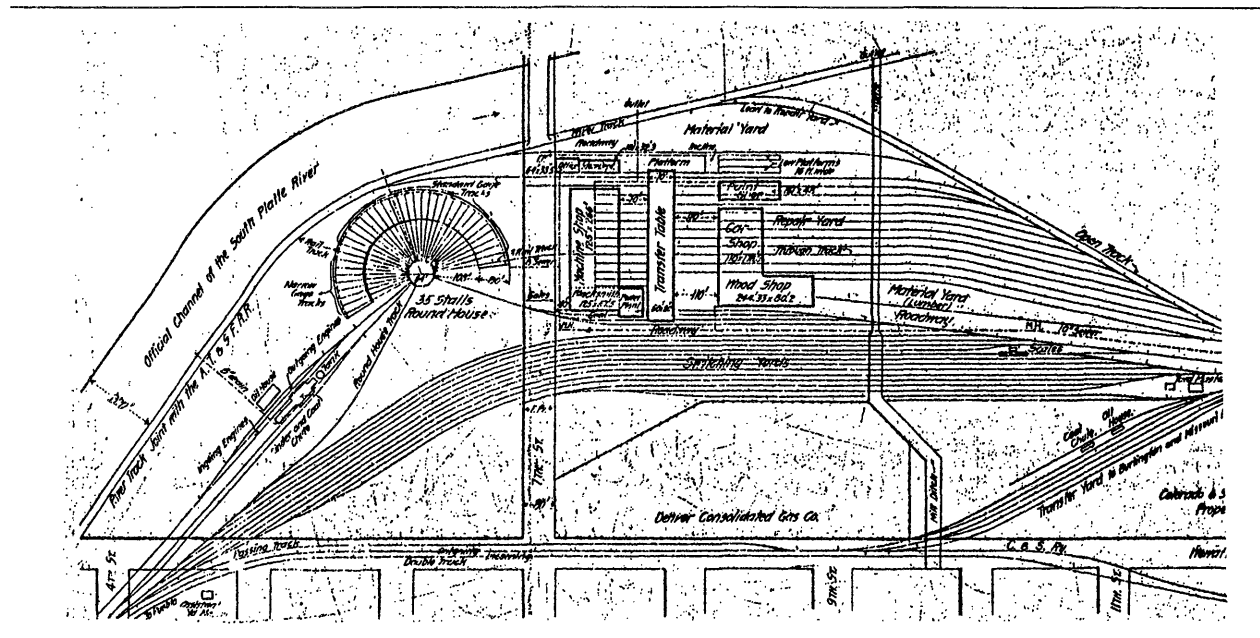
Engine house and rail yards of Colorado & Southern Railroad, Denver, from Railroad Gazette
